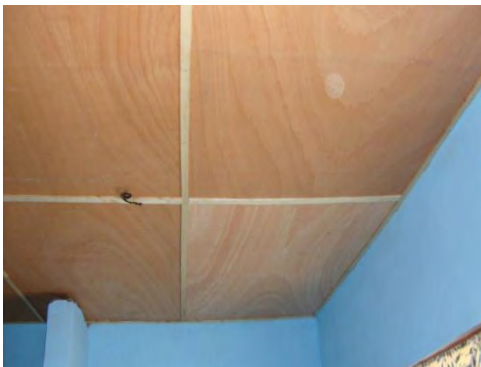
Wood as a ceiling material at FORIG, Kumasi, Ghana
